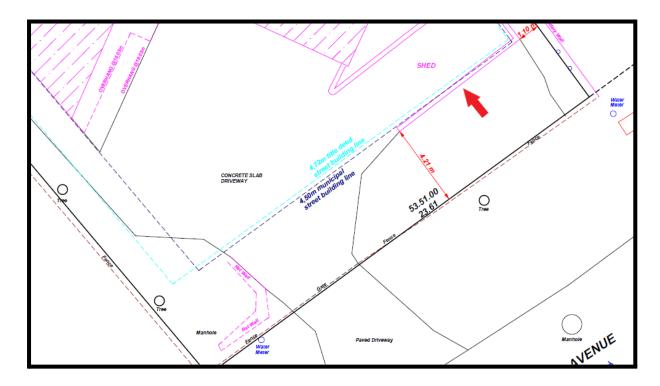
STREET BUILDING LINE ENCROACHMENT
